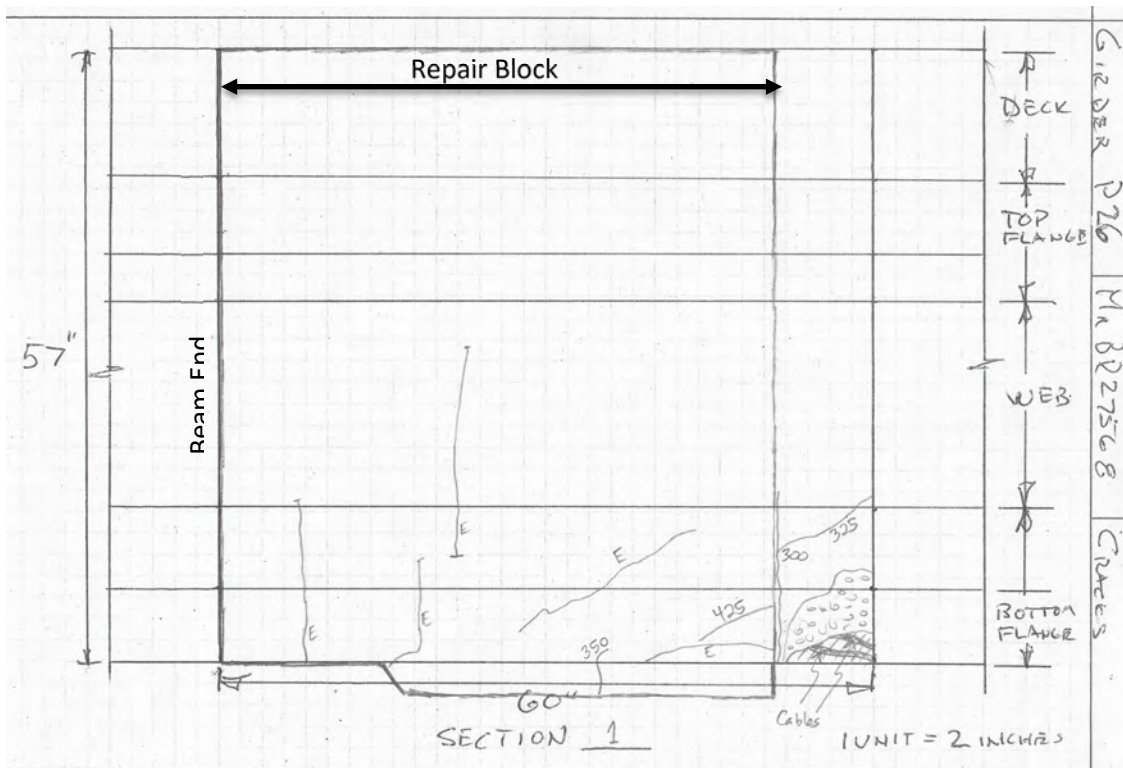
Girder P26 crack pattern – Section 1 (See Figure 3.4 for Section limits)
